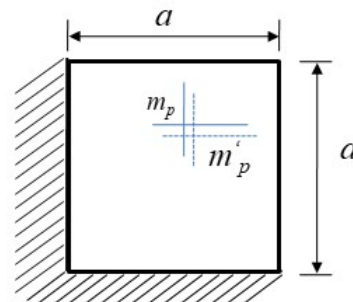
Sample square reinforced concrete slab built-in on two adjacent edges.
